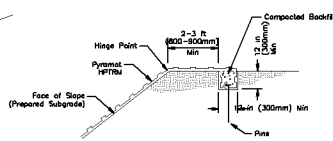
INITIAL TRENCH AT TOP OF SLOPE DETAIL
